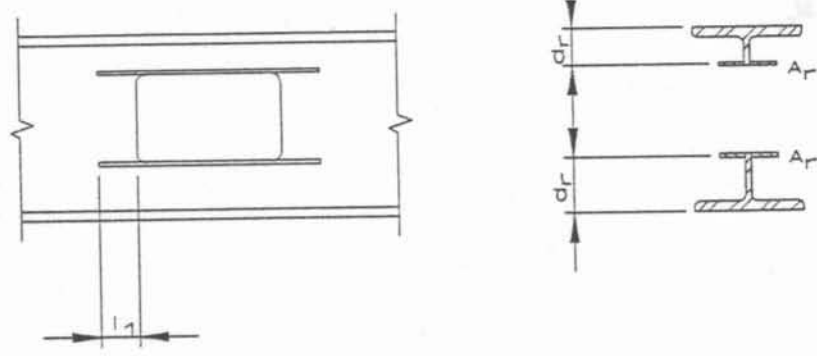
(b) Opening Configuration for a Reinforced Steel Beam
